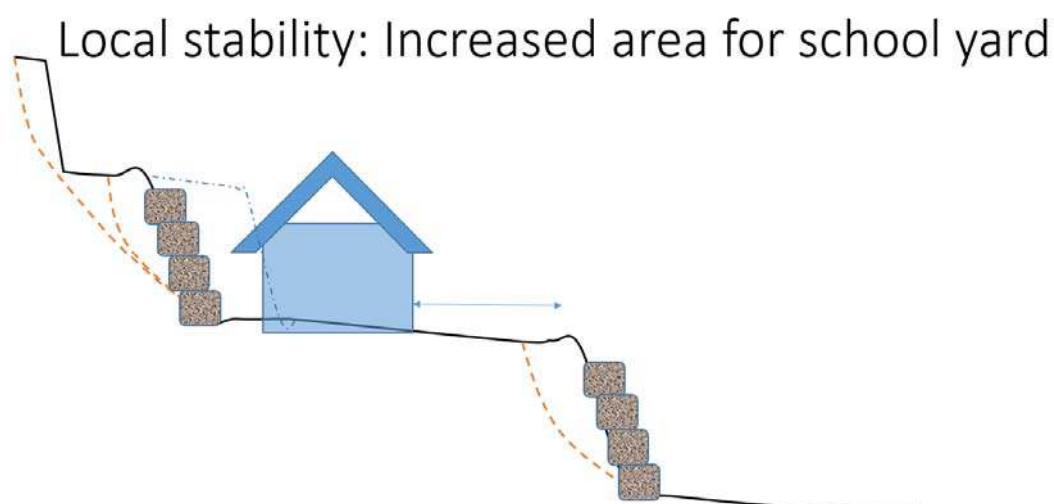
Backslope excavated backwards to increase space for schoolyard.
